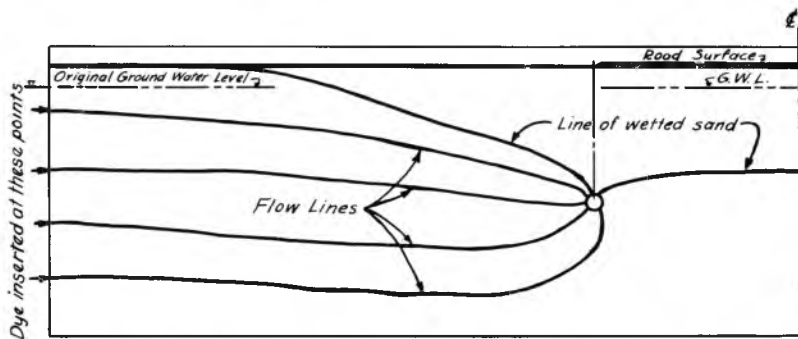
Drain at edge of roadway. Flat terrain—high ground-water table. Eight-inch perforated pipe below edge of roadway. Backfill same as surrounding soil. Bottom of drain 5½ feet below ground-water level.
